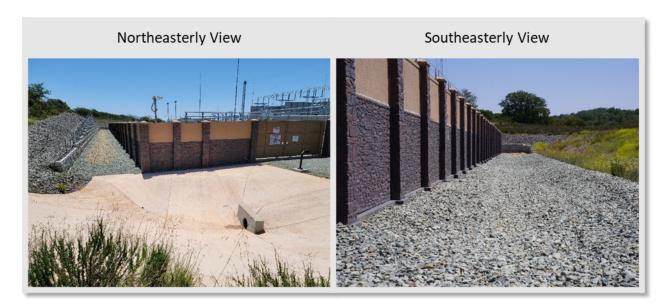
HWT Suncrest Facility Concrete Wall and 30-foot-wide crushed rock fire break
